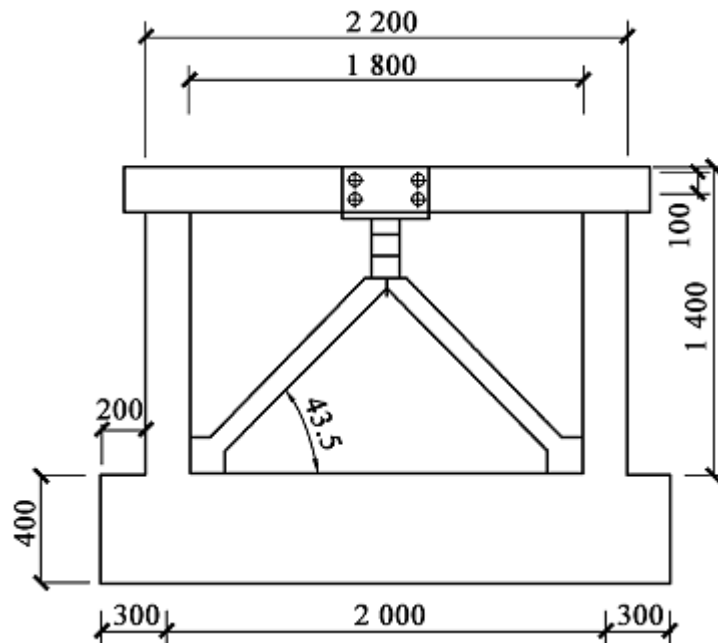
RC test specimen with eccentric bracing (in mm) (Da-peng et al., 2012)
